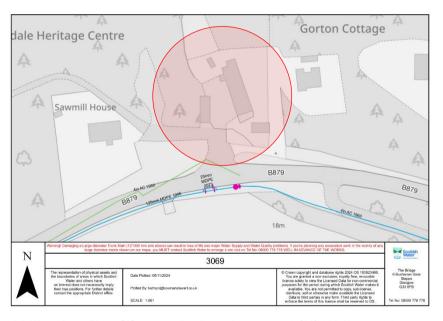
Outtake from Scottish Water Asset Plans GIS maps - showing mains system. 05/11/2024. Not to scale
